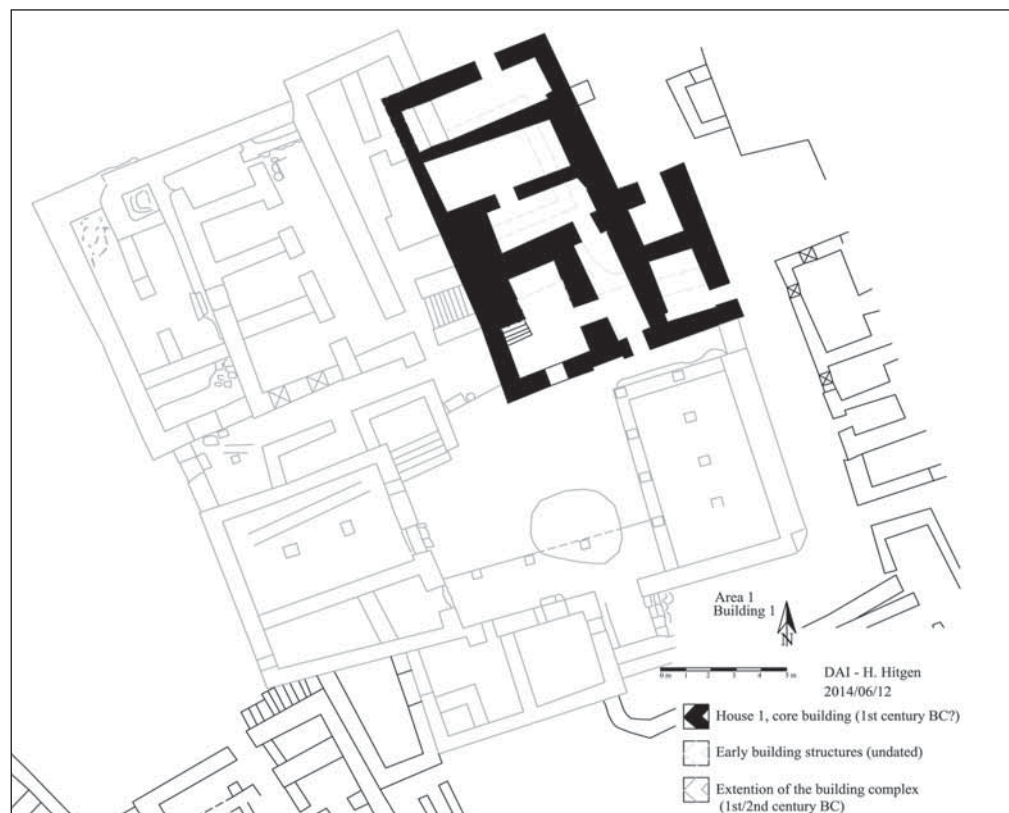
Schematic ground plan. The core and first building phase of house 1, area 1 is comparable with the so-called 'tower house' (© DAI, Hitgen)
